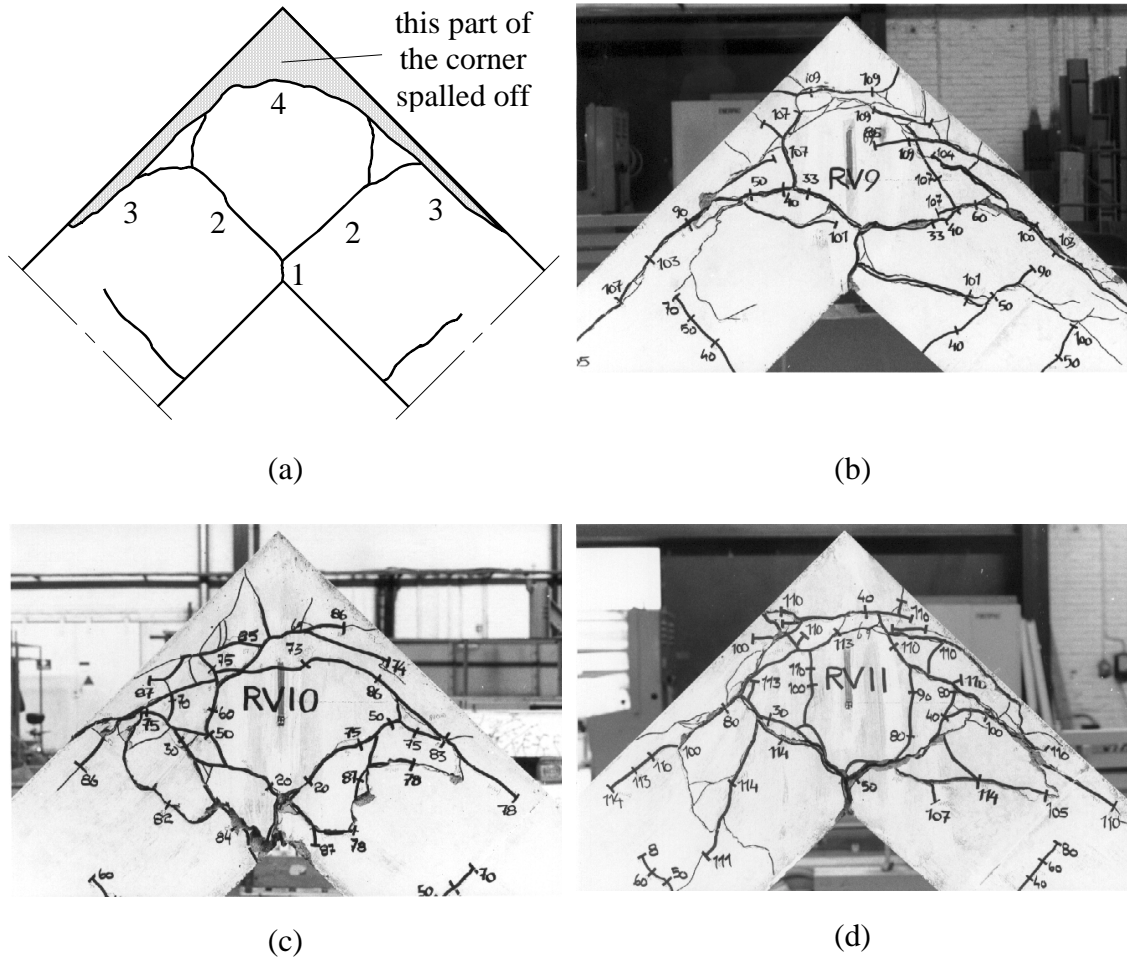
Crack patterns in frame corner subjected to opening moment: (a) schematic sketch of crack propagation; (b) specimen RV9; (c) specimen RV10 ; and (d) specimen RV11.
